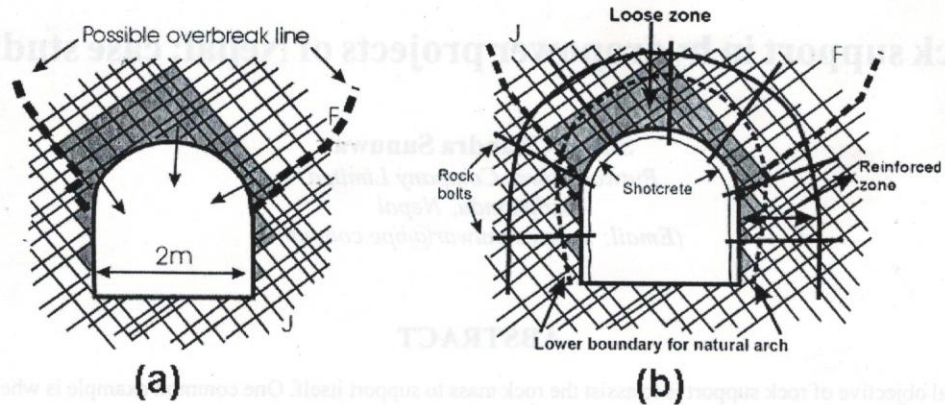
Sketch of a tunnel section depicting: (a). Possible failure path after excavation due to changing of stress field around opening and; (b). Rock supports (i.e. rock bolts and shotcrete) helping the rock mass to support itself by an arching effect
